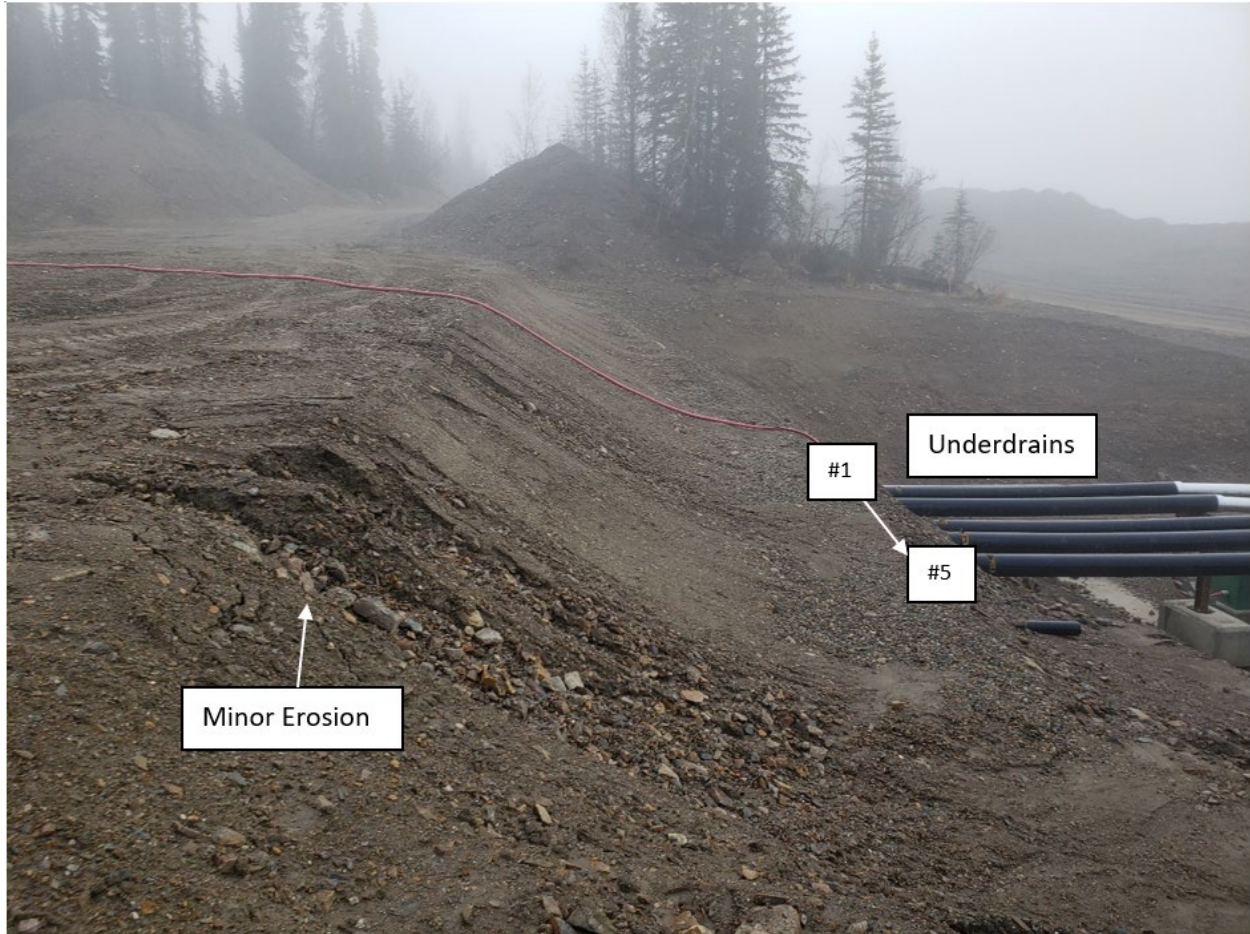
HLF underdrain outlet between dam and monitoring vault looking east.
